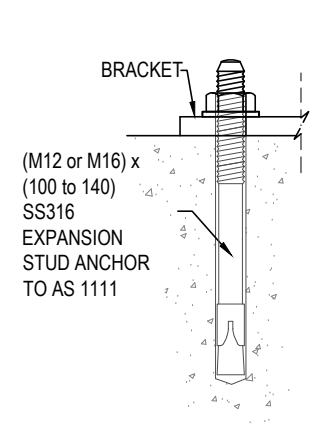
G (SECTION VIEW) EXPANSION CONCRETE STUD ANCHOR
